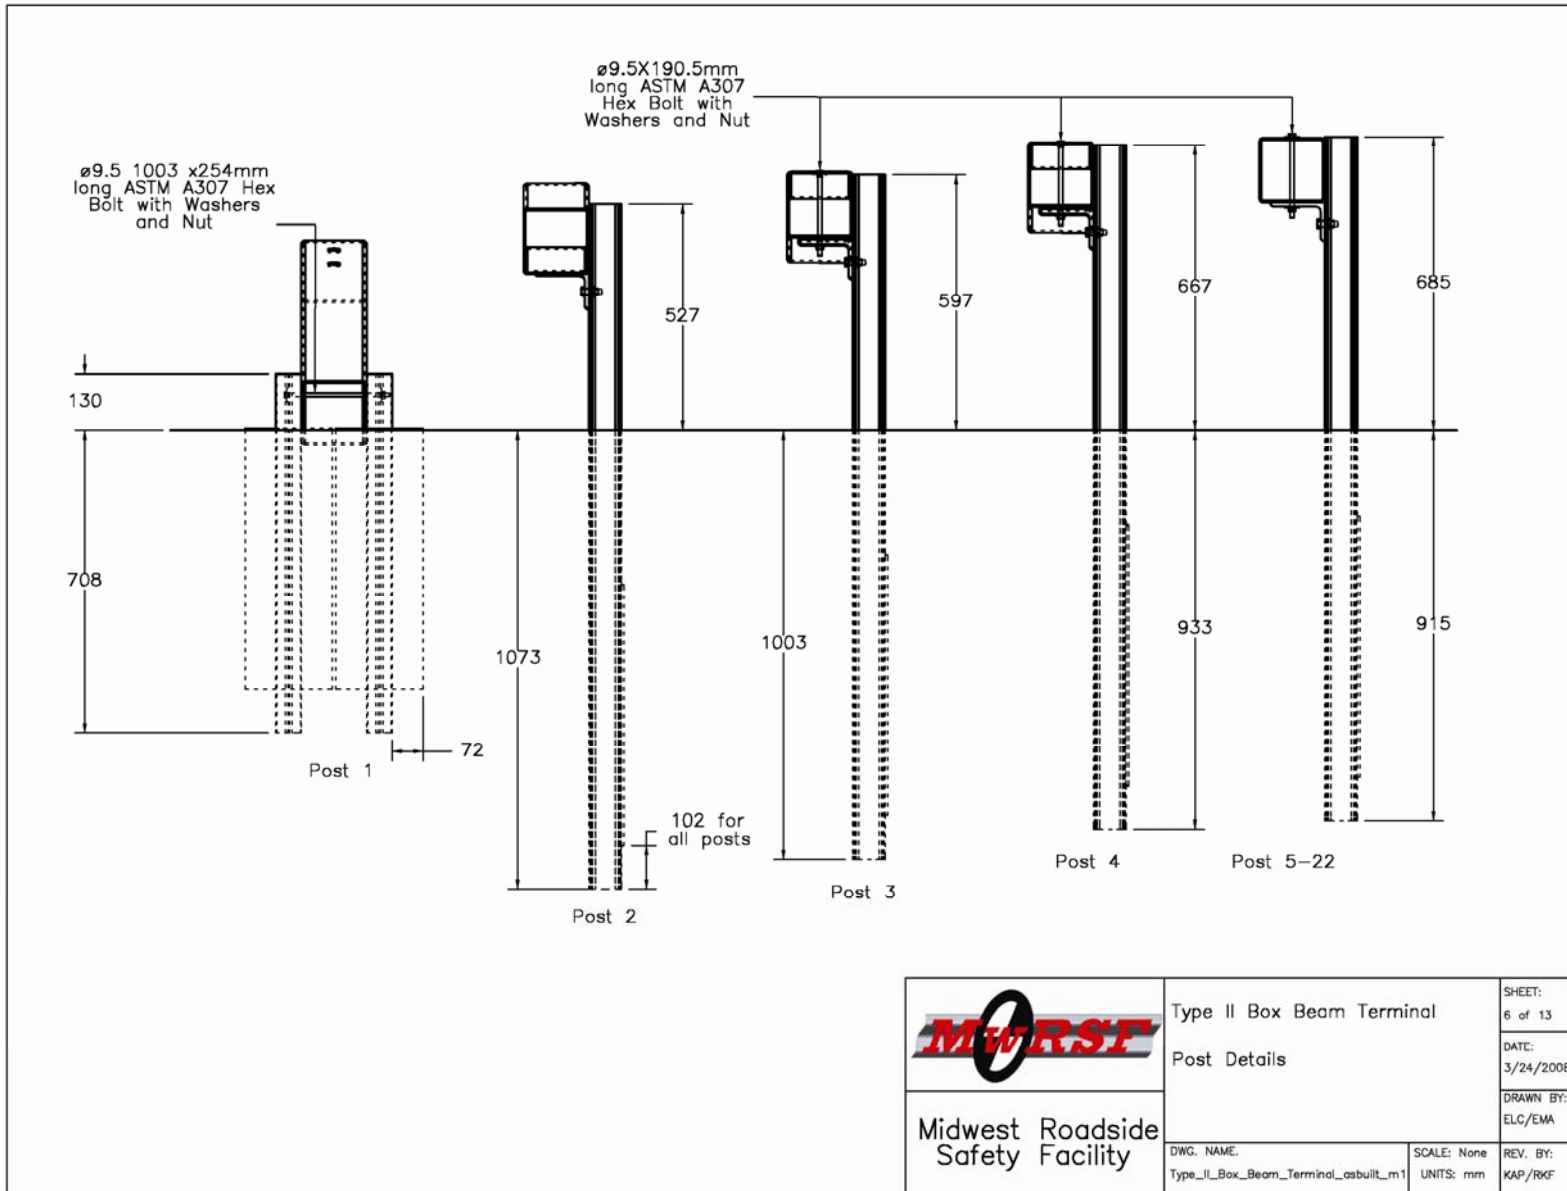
Type II Box Beam System Details, Test No. NYBBT-1
